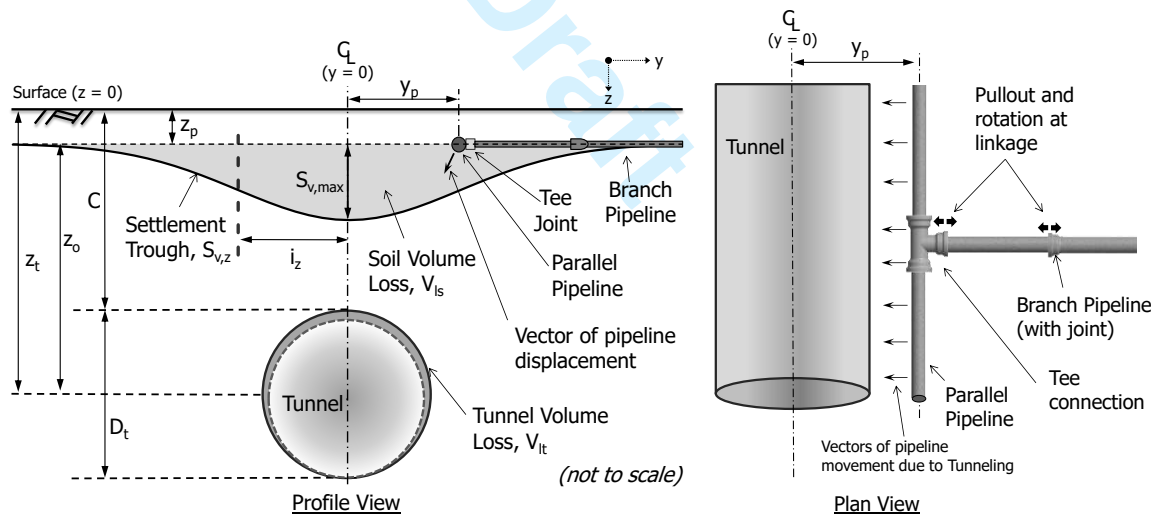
Illustration of tunnel cross-section, settlement trough and parallel pipeline with tee connection
